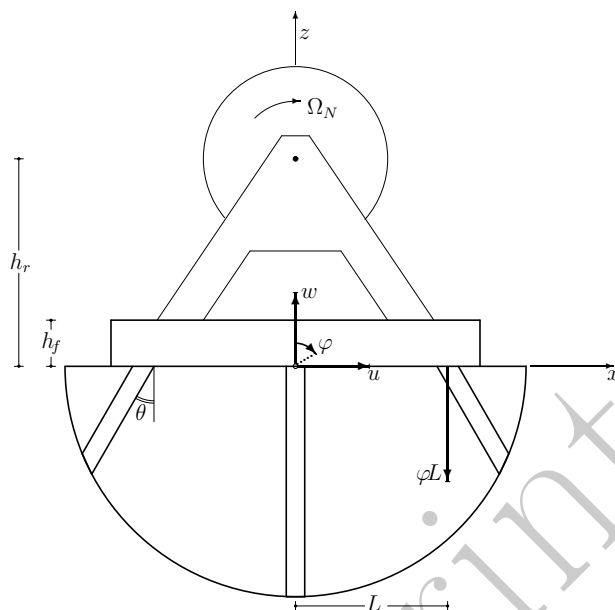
A sketch of the problem: a rotor supported by a slab foundation on inclined piles.
